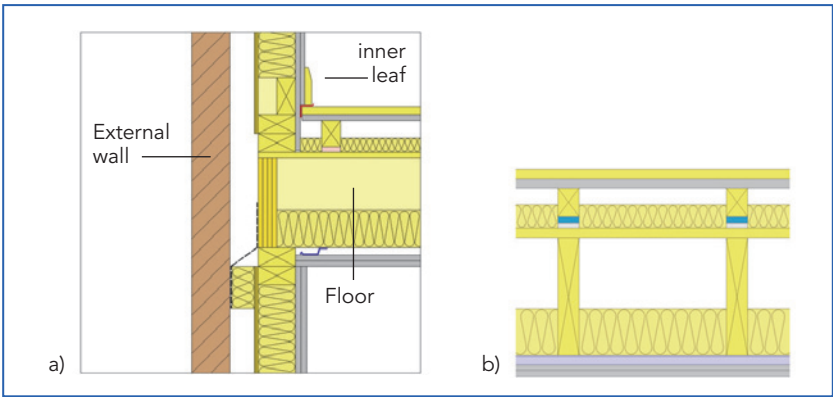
a) Junction with external wall. b) Section of separating floor.
